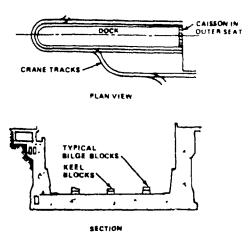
TYPICAL GRAVING DRYDOCK13
